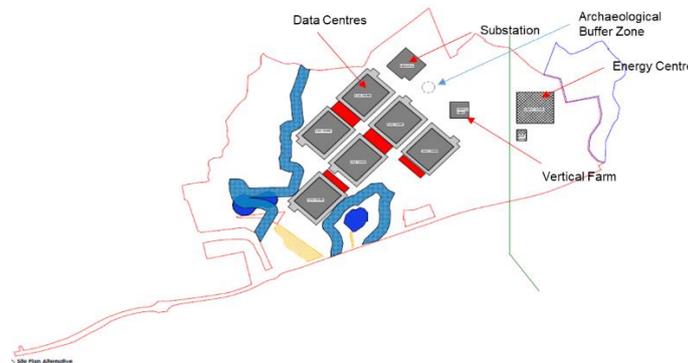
Proposed Layout (Layout 2) Alternative location of Substation and Vertical farm
